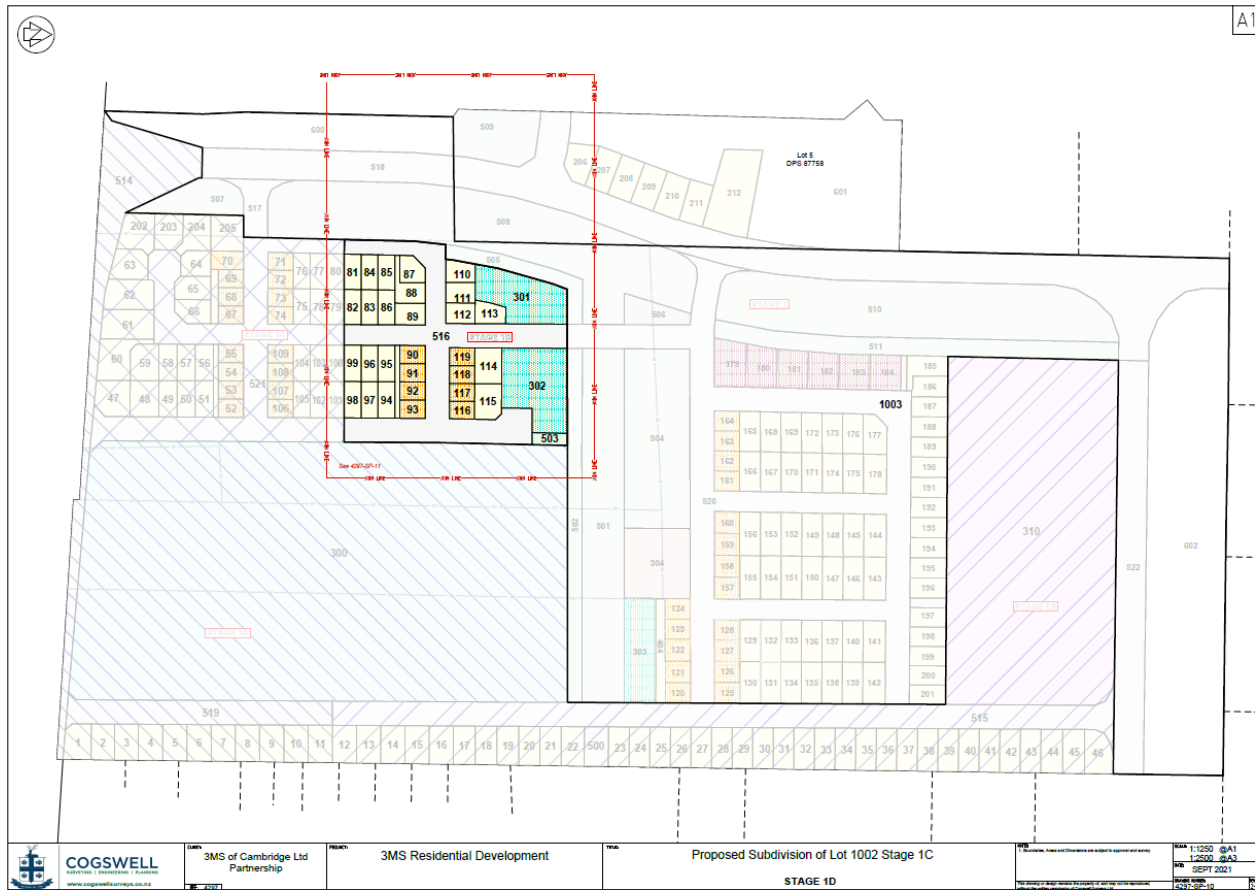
Proposed scheme plan showing extent of Stage 1D.
